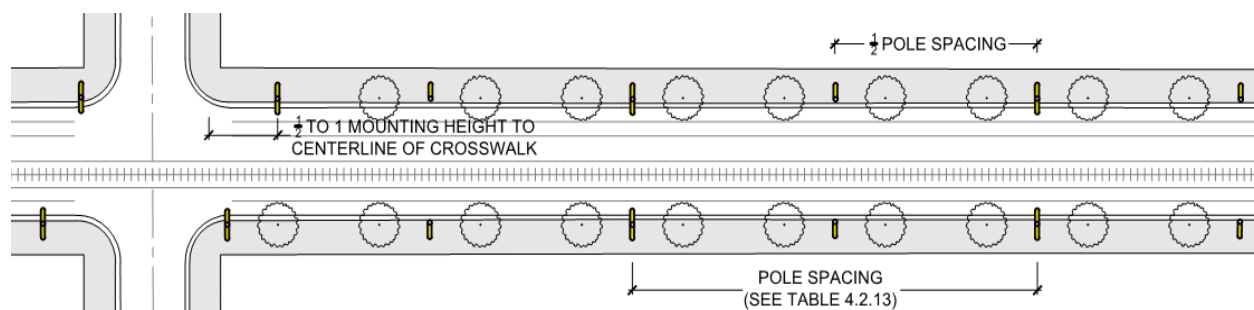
Typical S-Line Transit Street and Pedestrian Lighting Section
